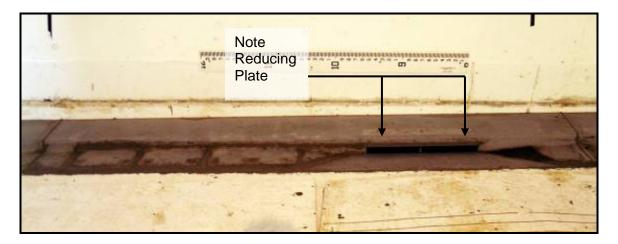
R5 with 4-in. Curb Opening Photograph
